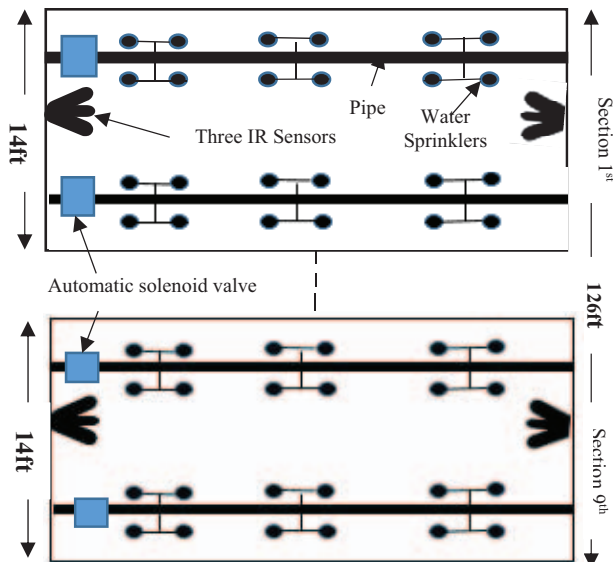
Top view of the installed sensors based sprinkler system in the hall
